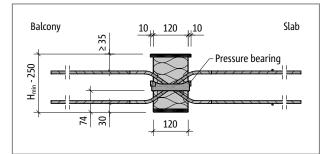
Schöck Isokorb® XT type Q-VV5 to Q-VV8: Product section
